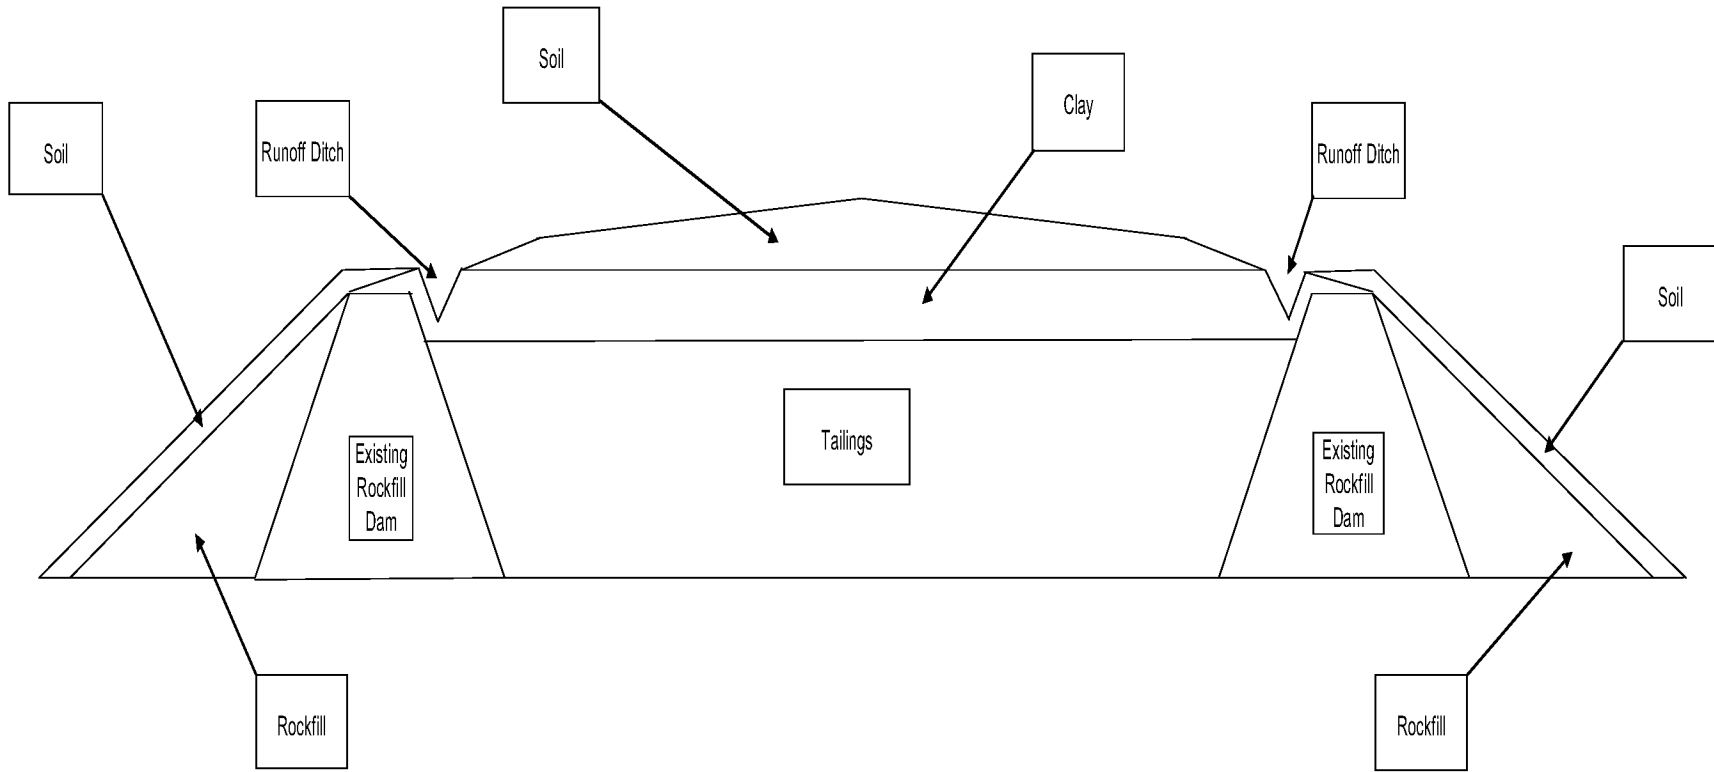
Cross-Section of Reclaimed Tailings Facility
